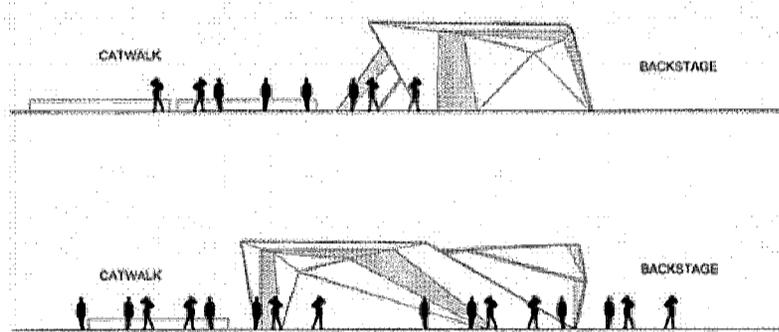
Catwalk elevation demonstrating the sculptural intervention's central position between public and private¹¹⁰
